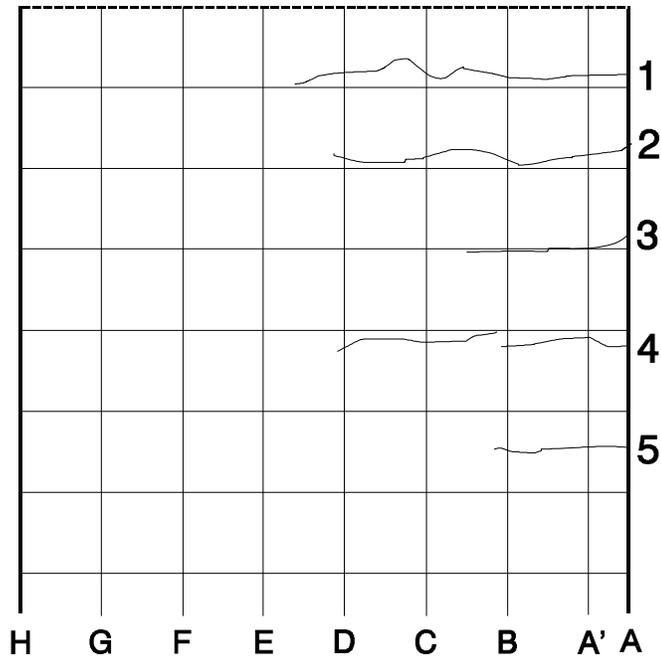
POJ-PS-100 cracking patterns on south face of joint at dead load
